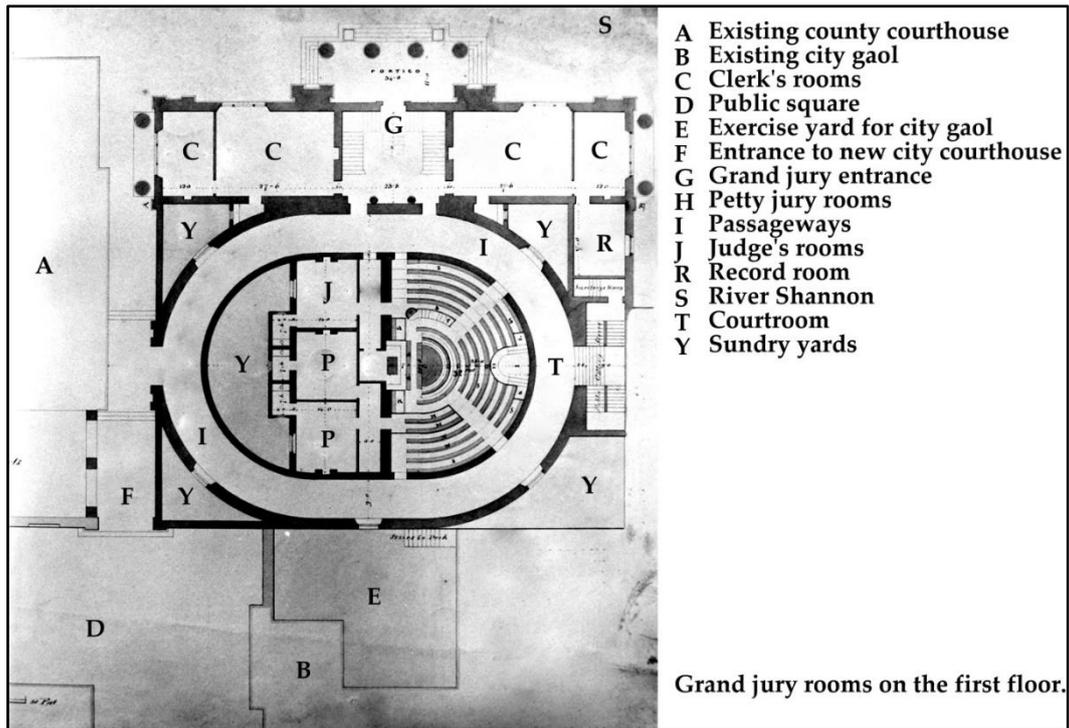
Limerick city courthouse, ground-floor plan, unexecuted. Henry Hill, June 1834. Hill's adaptation of Morrison's arrangement of semi-circular courtrooms demonstrates the impact that the new courthouse at Tralee had on courthouse design in Ireland. Here the design provided only one courtroom, with the other half rather inefficiently used for judge and jury rooms and a lengthy curved corridor. Reproduced courtesy of the Allen family.
